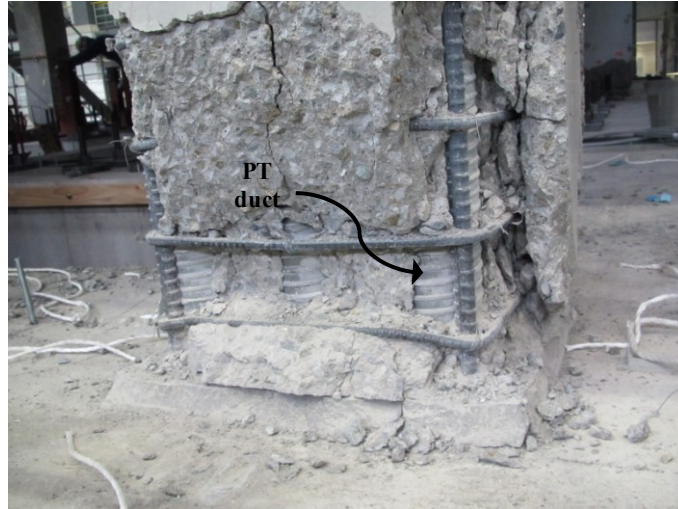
Damage at base of PT column at end of tests; picture courtesy of T. Nagae
